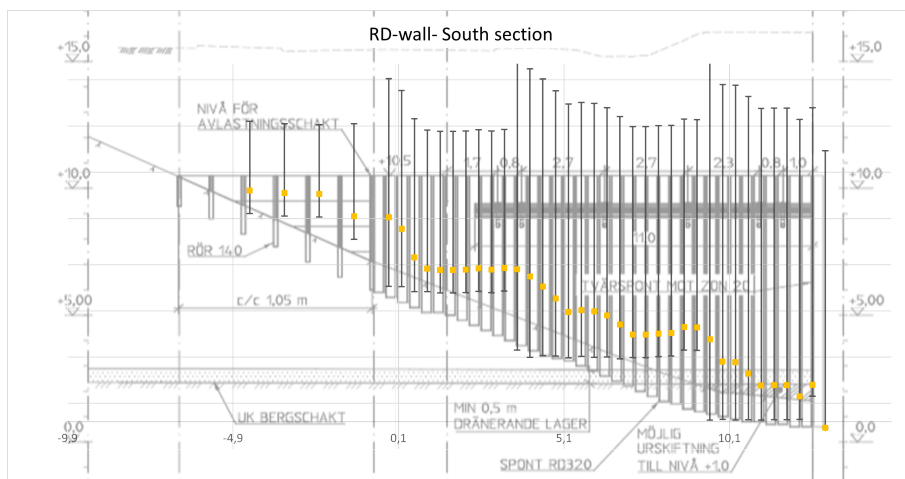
Rock surface model with pile wall level based on drill-protocols, south wall
